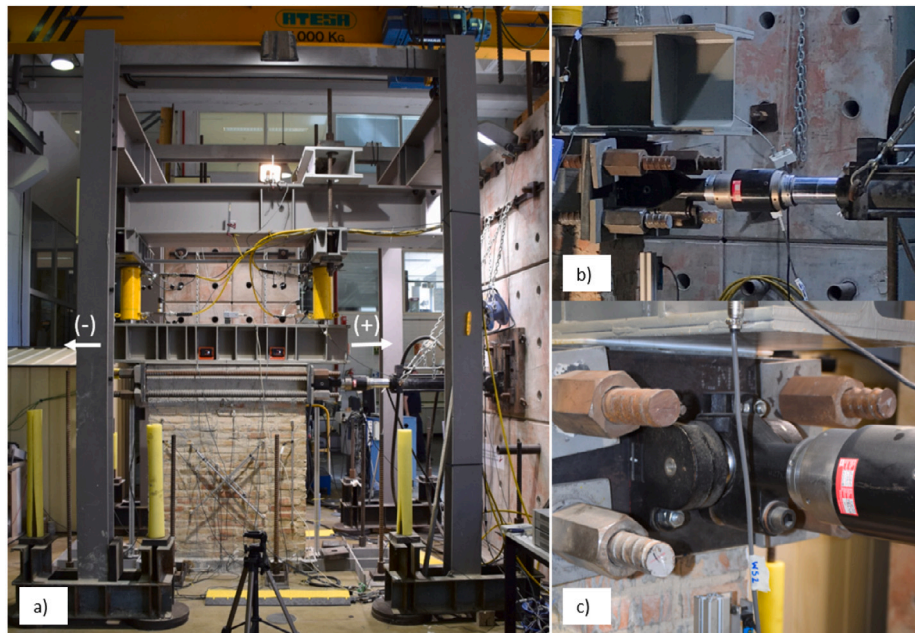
(a) General view of the Shear Compression Test set-up, (b) detail of the plate and rods mounted aligned with the actuator to applied the loading protocol, (c) hinged connection that allowed the reversed cyclic loading.
